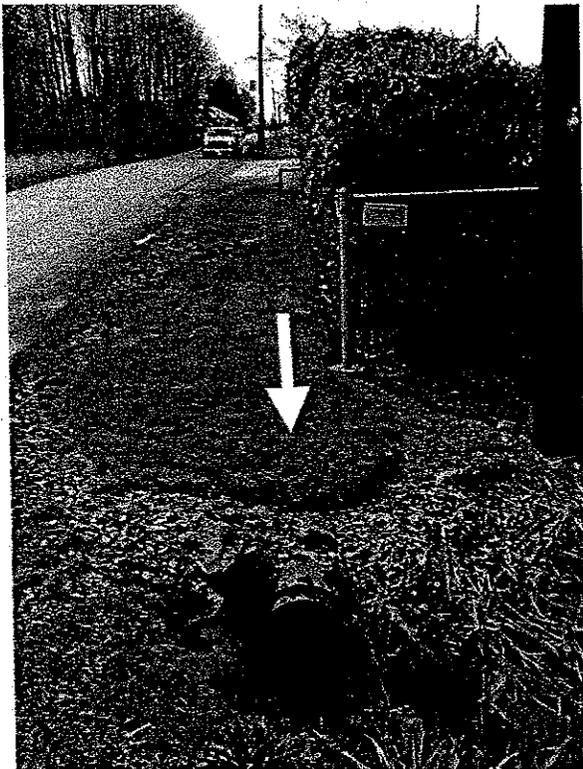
Outfall to Sultan Basin Road drainage, west side. Outfall comes from drainage ditch paralleling 135<sup>th</sup> Street SE. Looking west.
